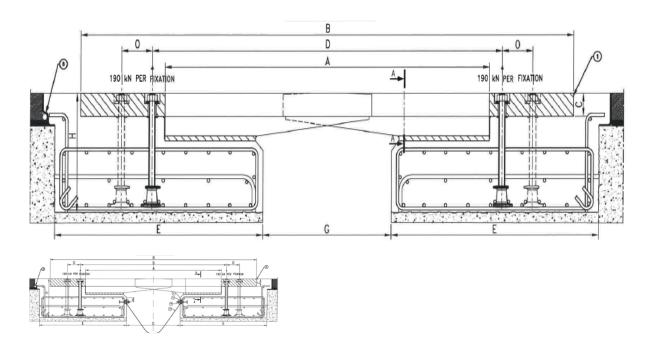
Typical cross section of elements WP750 to WP 1400 type 1 & 2
